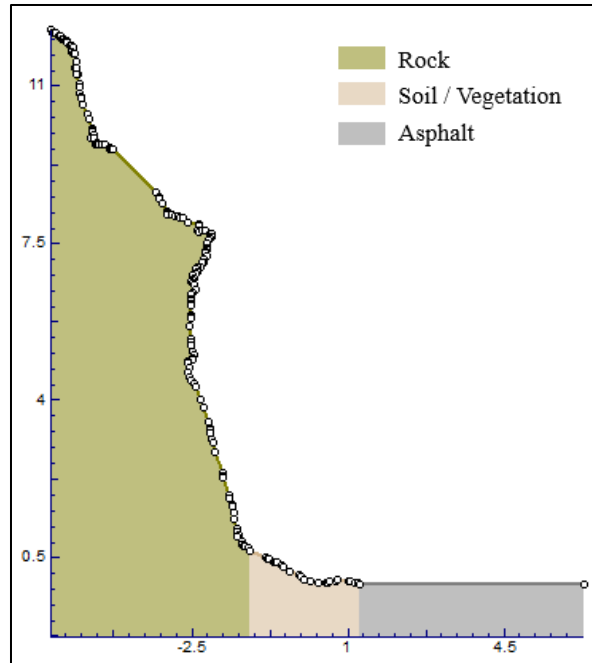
Sample cross-section of the test slope in Franklin 1, imported in RocFall. Units in meters.
